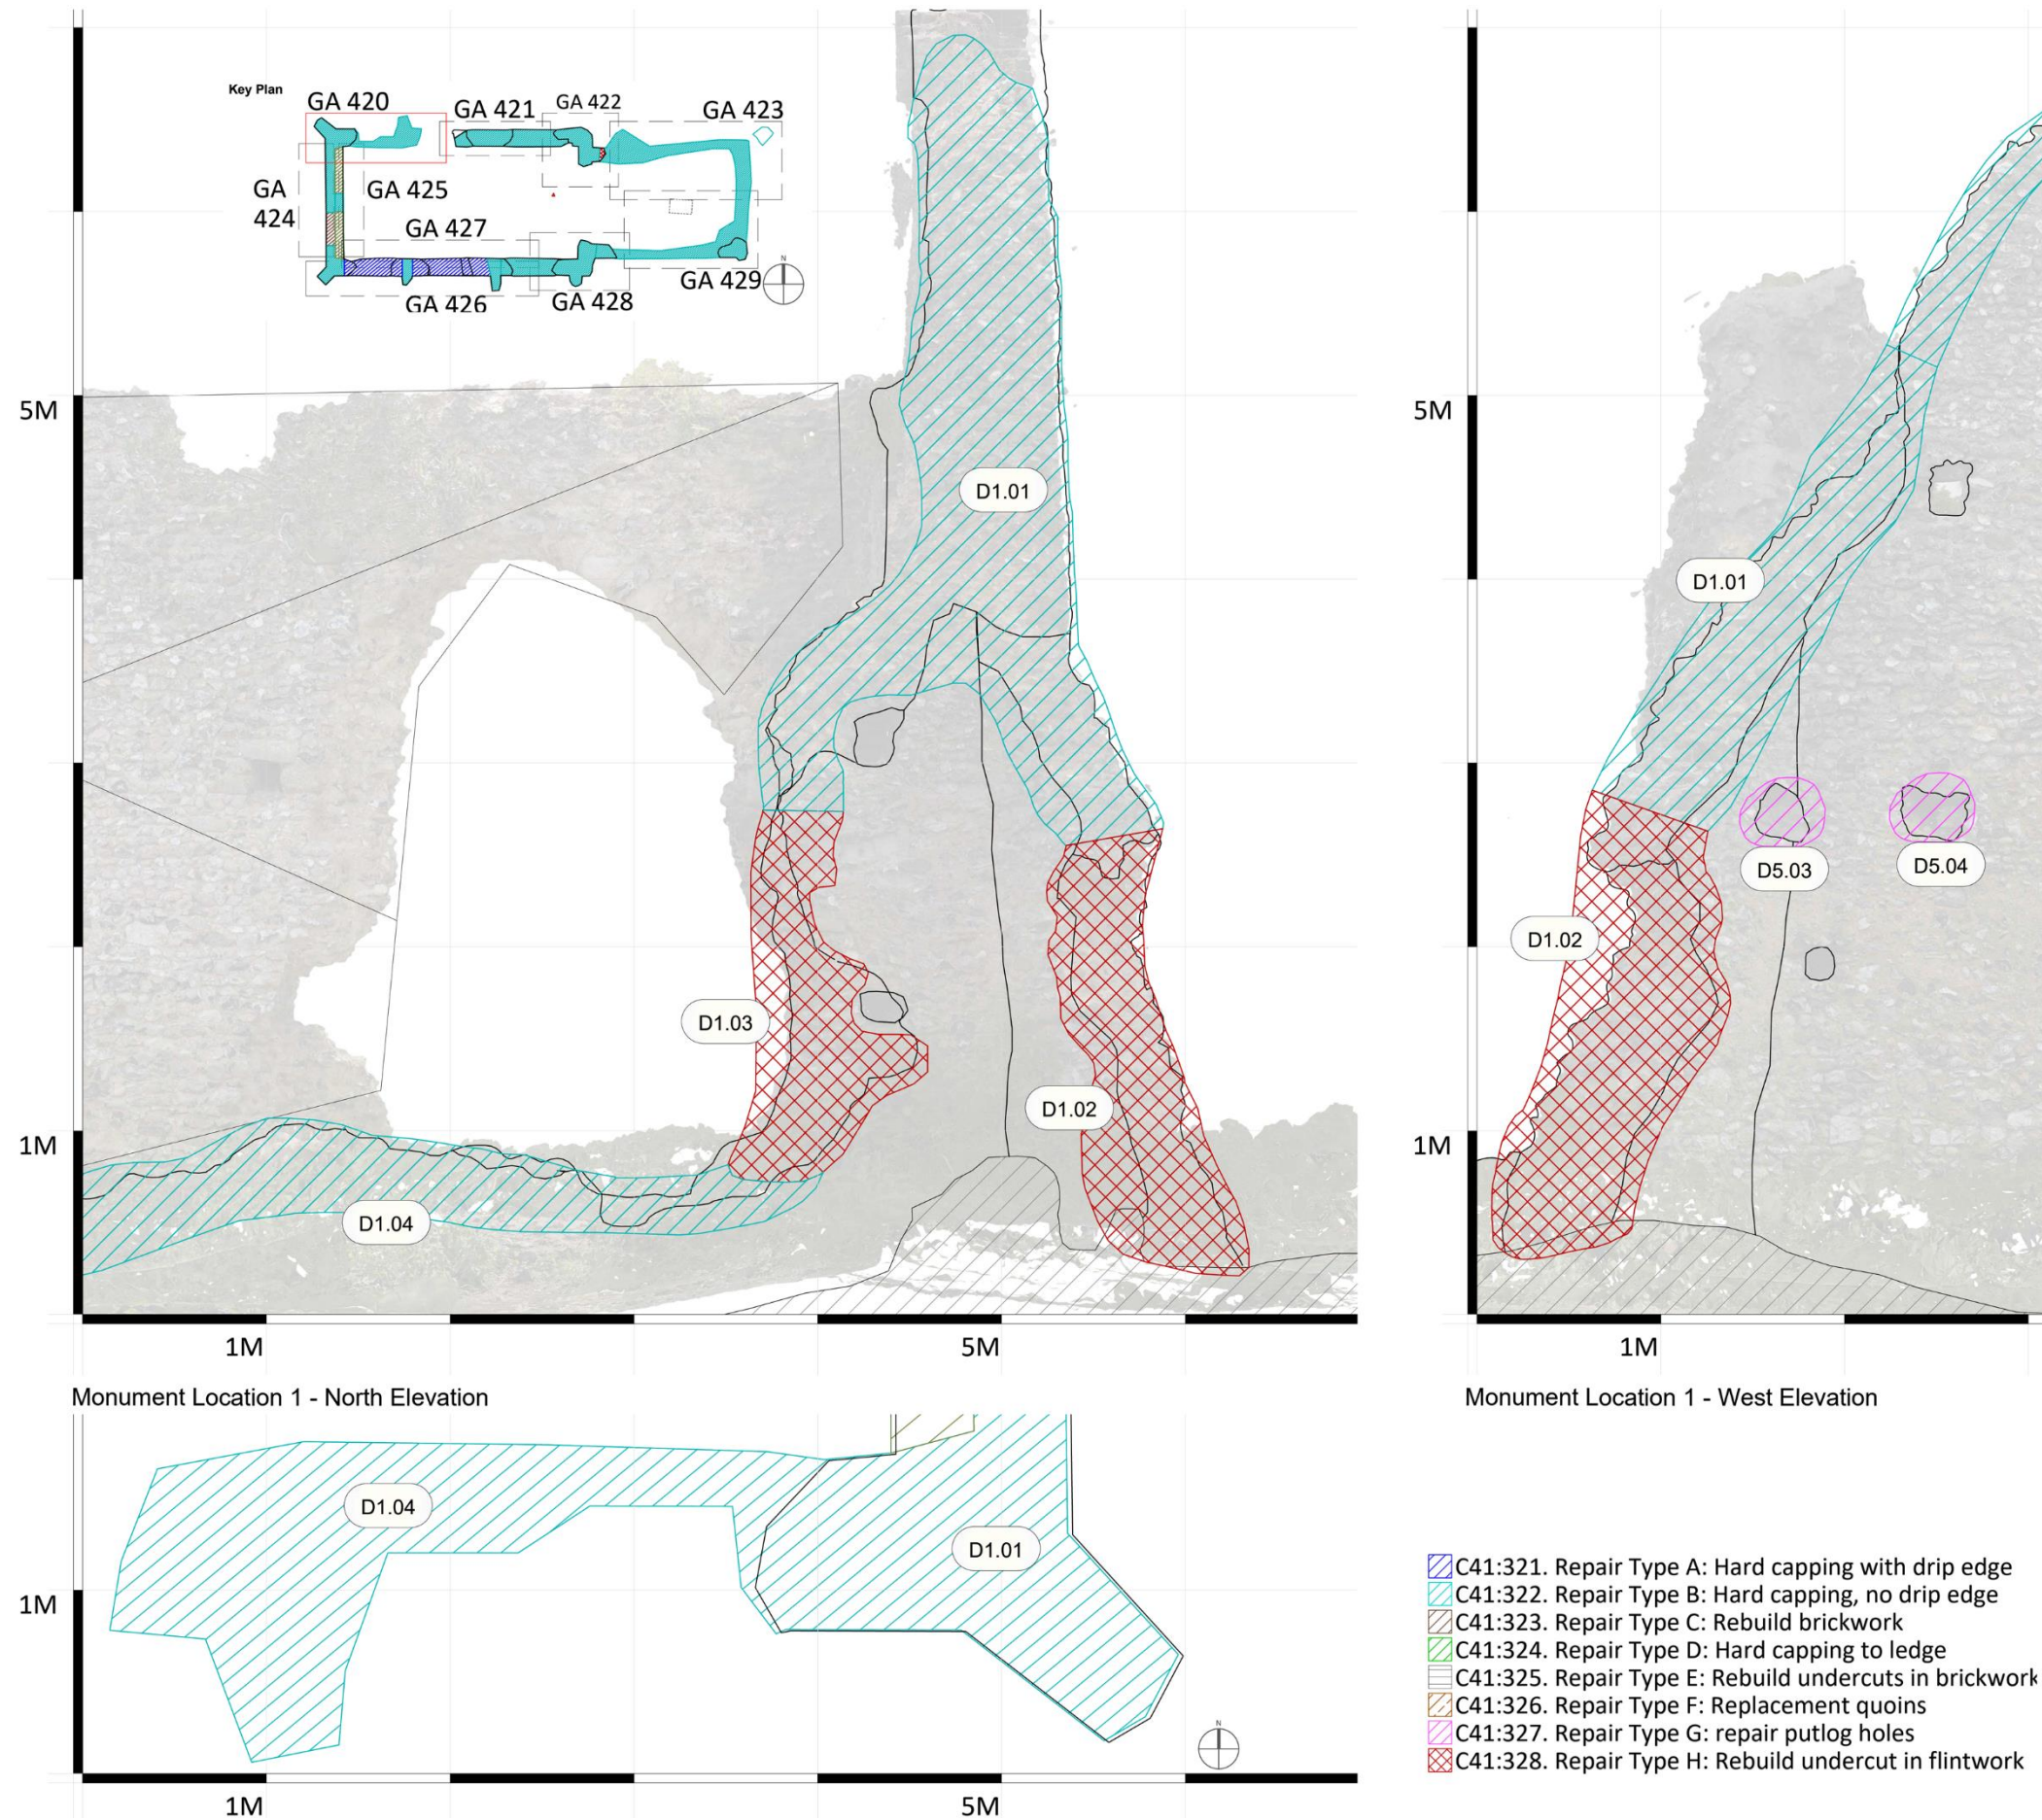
Works undertaken to the northwest corner (scale 1:40)
